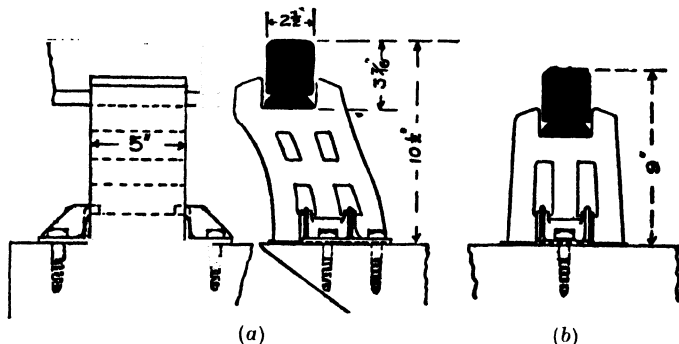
METHOD OF MOUNTING RECTANGULAR CONDUCTOR RAILS
